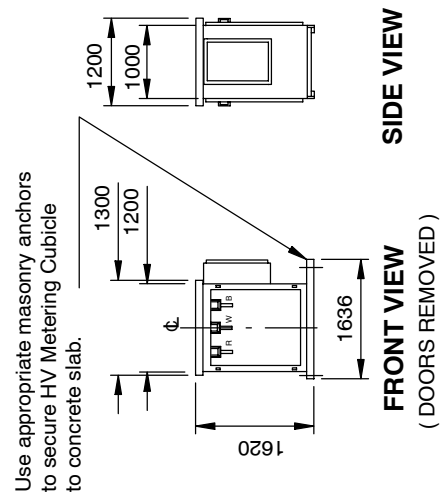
Typical HV Metering Cubicle - Foundation Details
